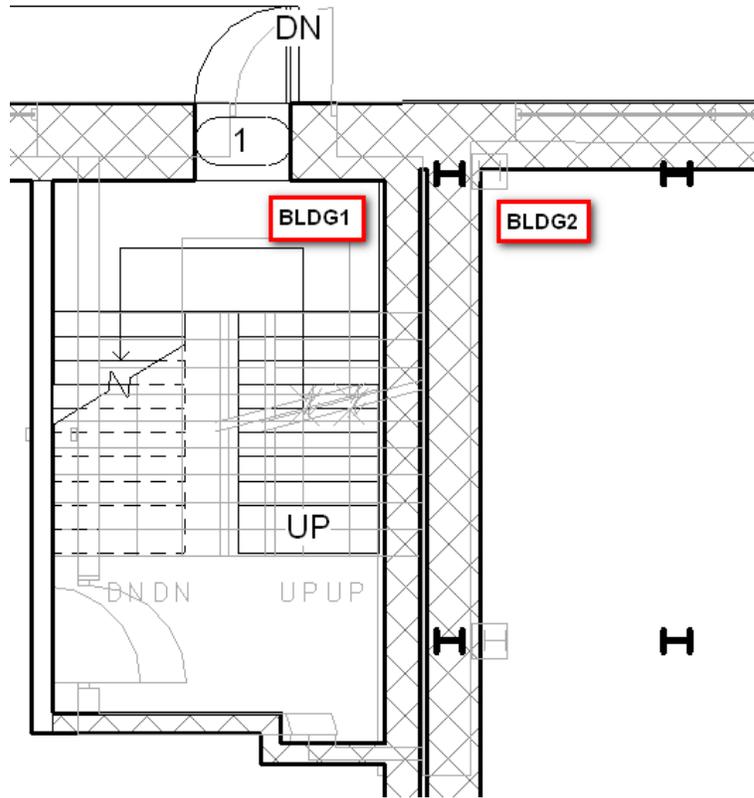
BLDG1 and BLDG2 Adjacent foundation walls and exterior walls.
